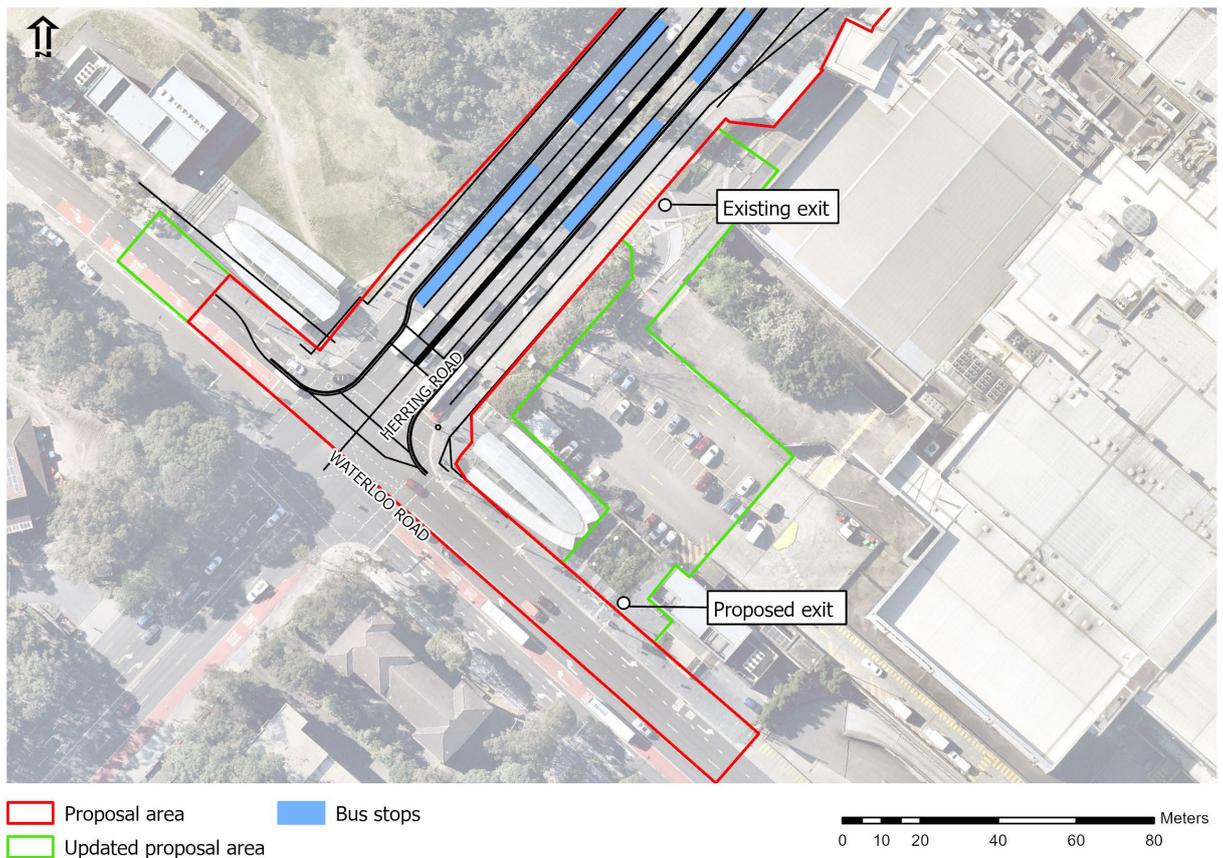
Location of existing and proposed Macquarie Centre exits
